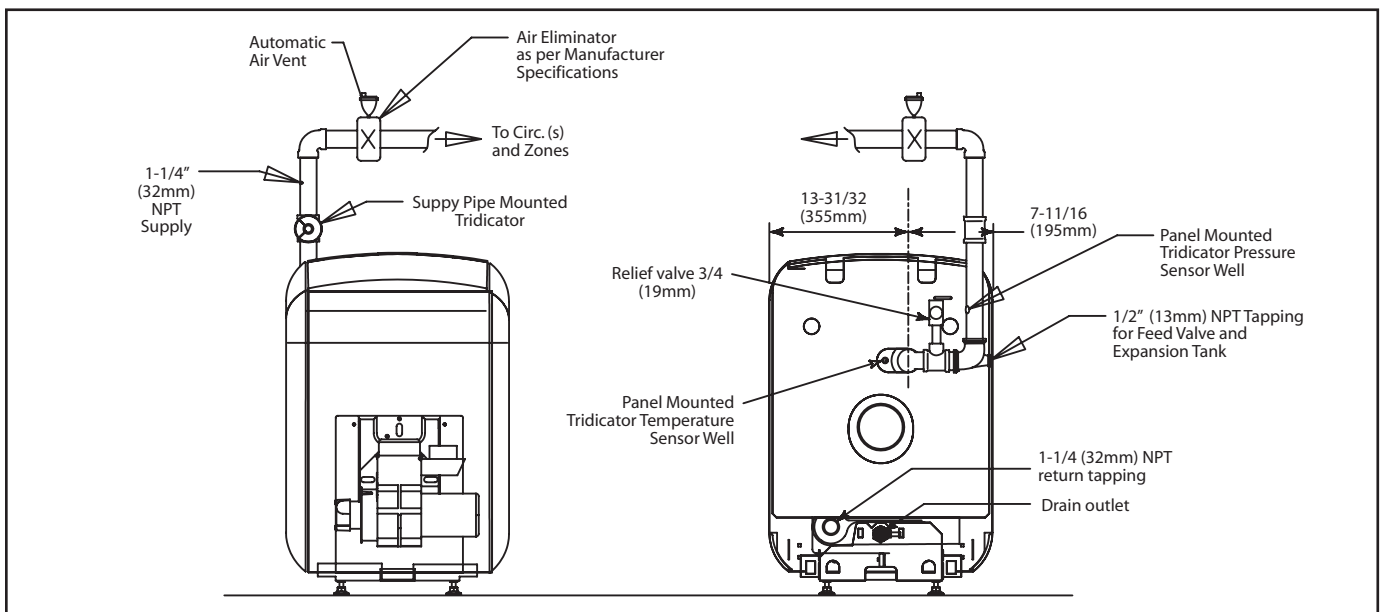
Air Eliminating System or Alternating Collecting System. Pipe off to a safe place the relief valve and drain outlet.
